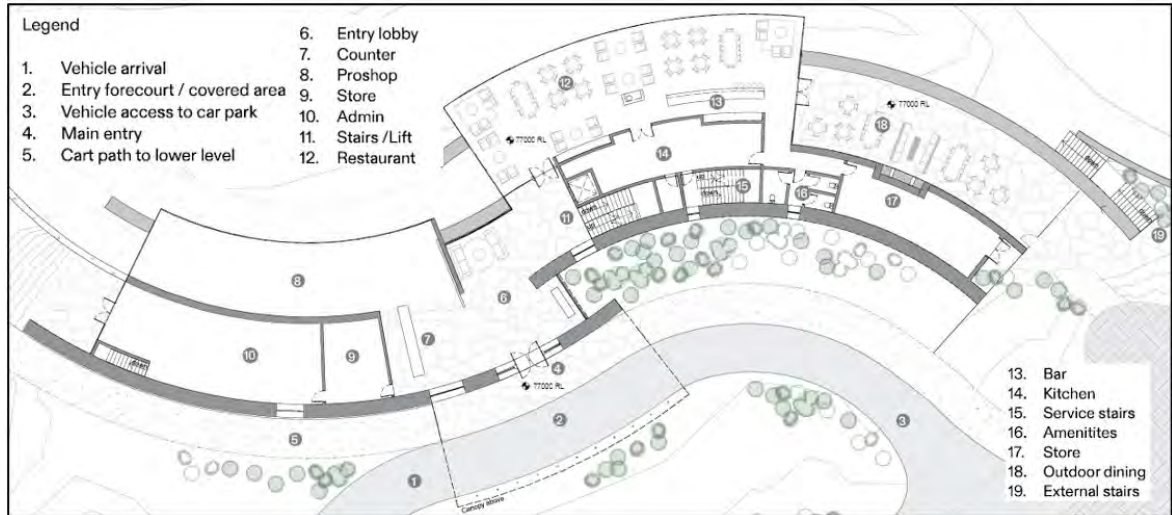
Proposed Clubhouse Entry Level Floor Plan
